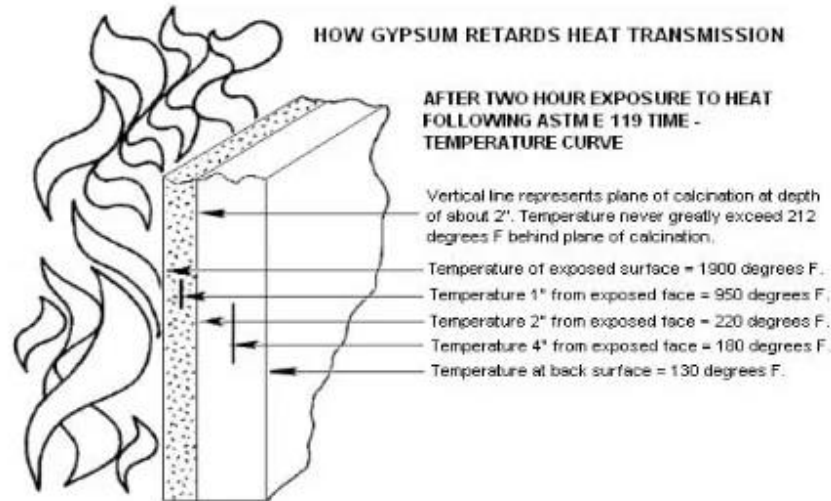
Gypsum heat retarding property [from:<https://theconstructor.org/building/gypsum-products-properties-building-construction/14949/>]
